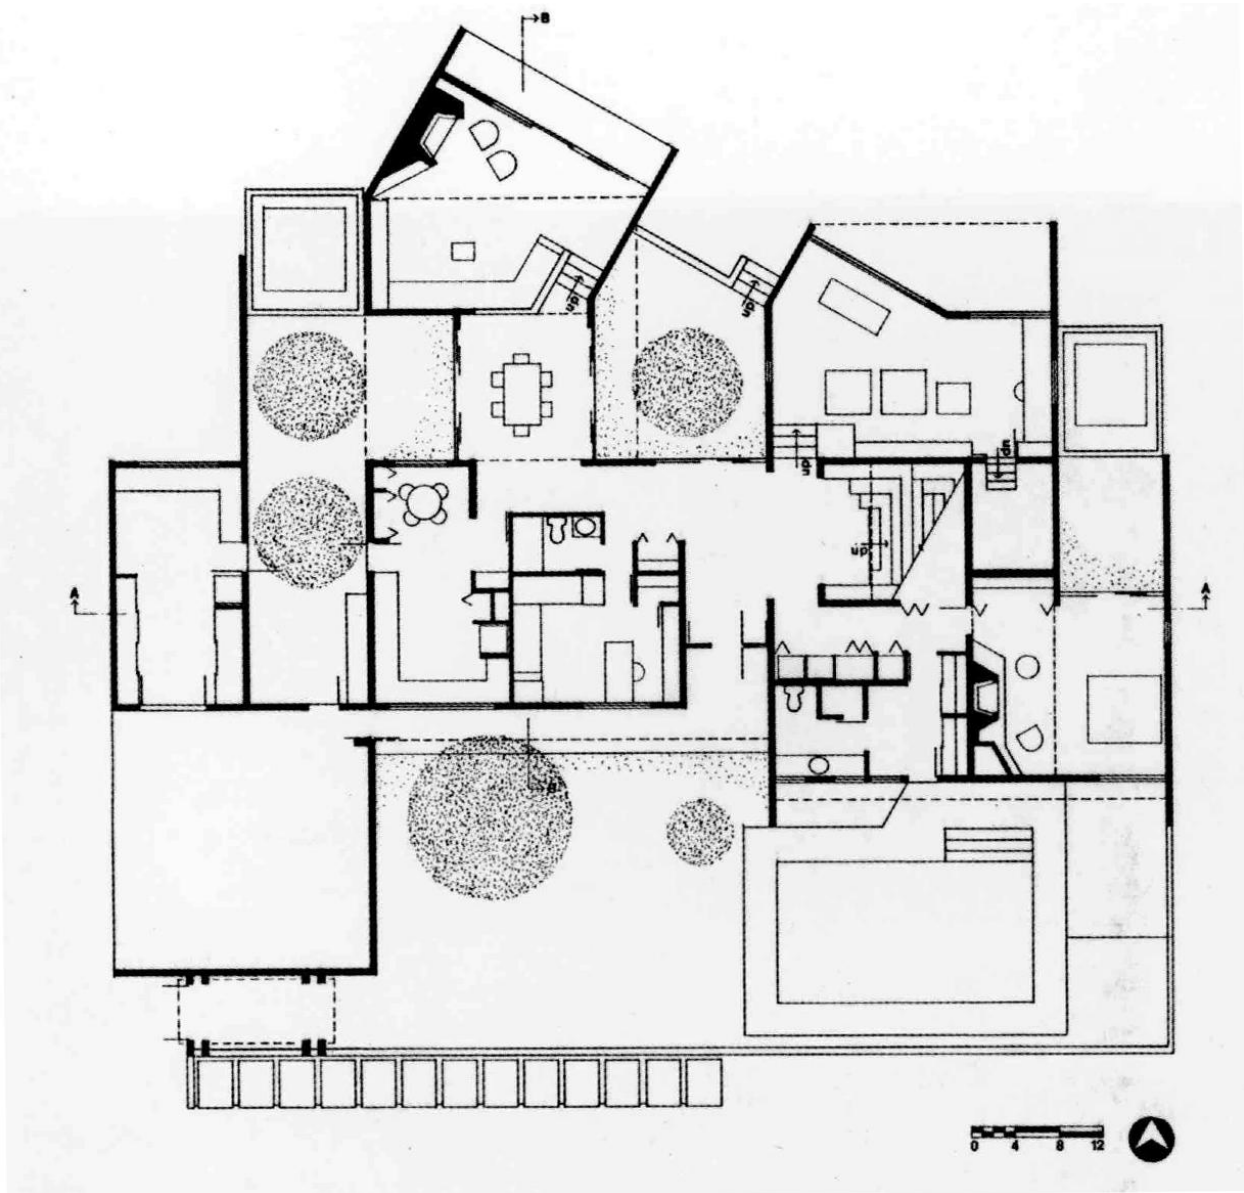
Jacobson House, floor plan.. Published in Powerhouse, 2019.
